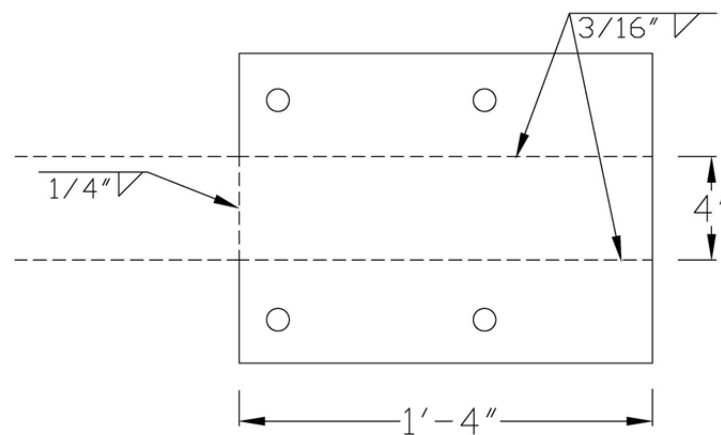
Blunt-End Parapet Retrofit – Base Plate Weld Design
